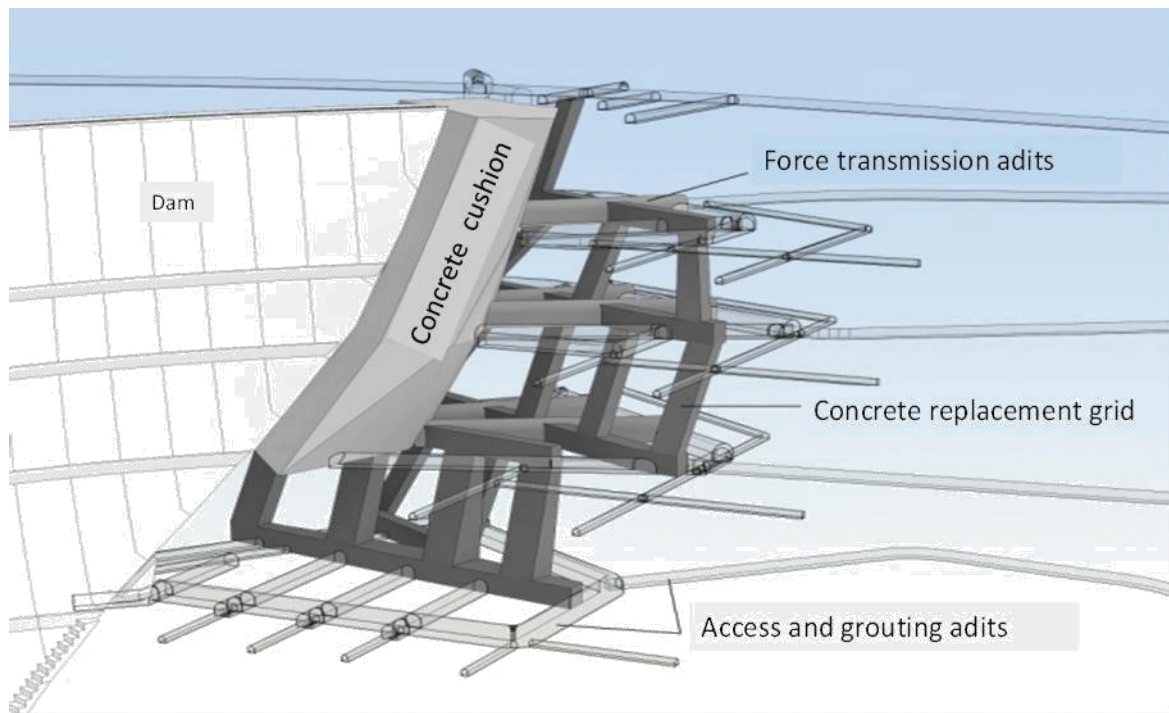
Foundation treatments layout in the upper part of the Jinping I Dam left abutment.
